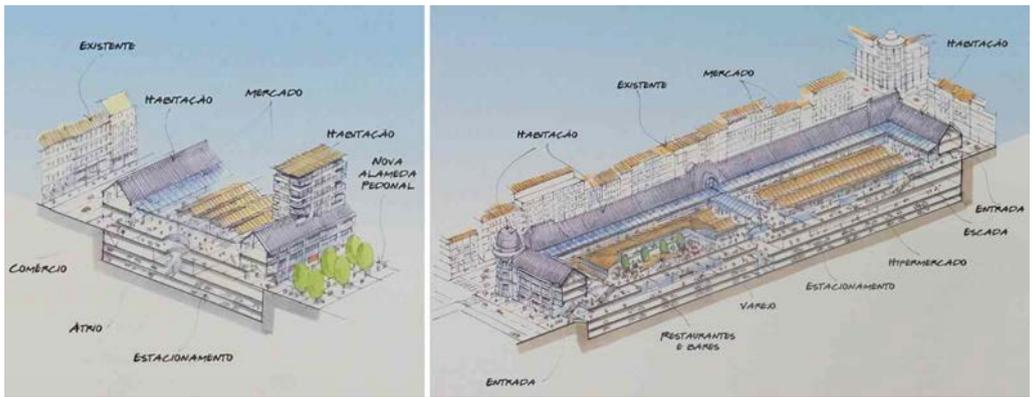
Axonometries of the Tram Crone proposal. The cross-section presents option B - build a housing tower on the market wing facing Alexandre Braga Street (five floors).
